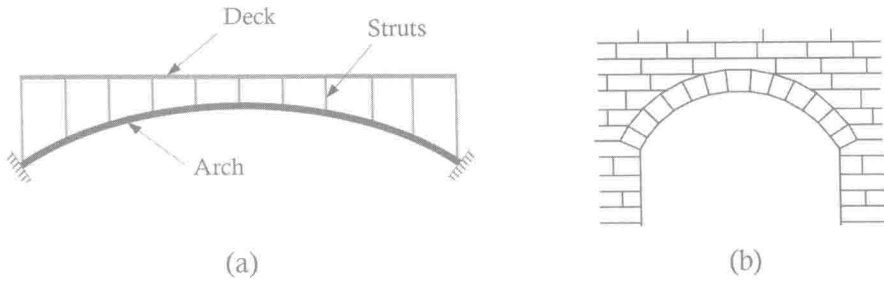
Common arches. (a) Arch supporting a bridge deck. (b) Arch in a masonry wall.
